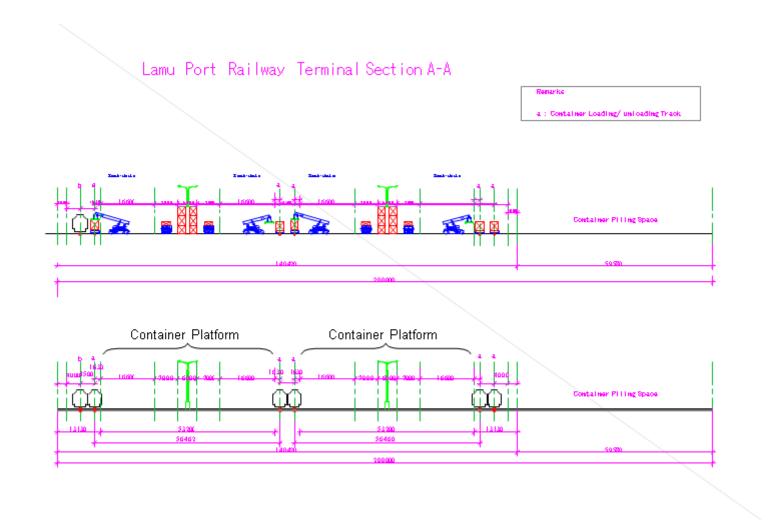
Lamu RFT - Cross Section A-A - Container Loading / Unloading Facilities (JPC study)
